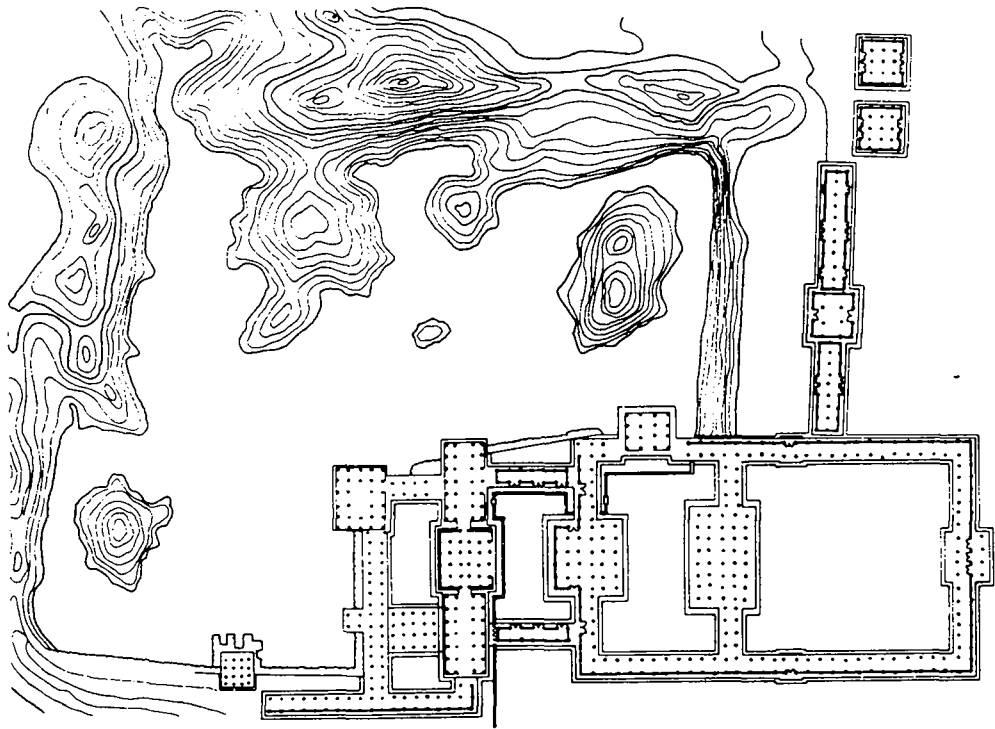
Reconstructed layout of An-ab-chi 雁鴨池 안압지 (Unified Silla, scale: 1 : 2,000)
